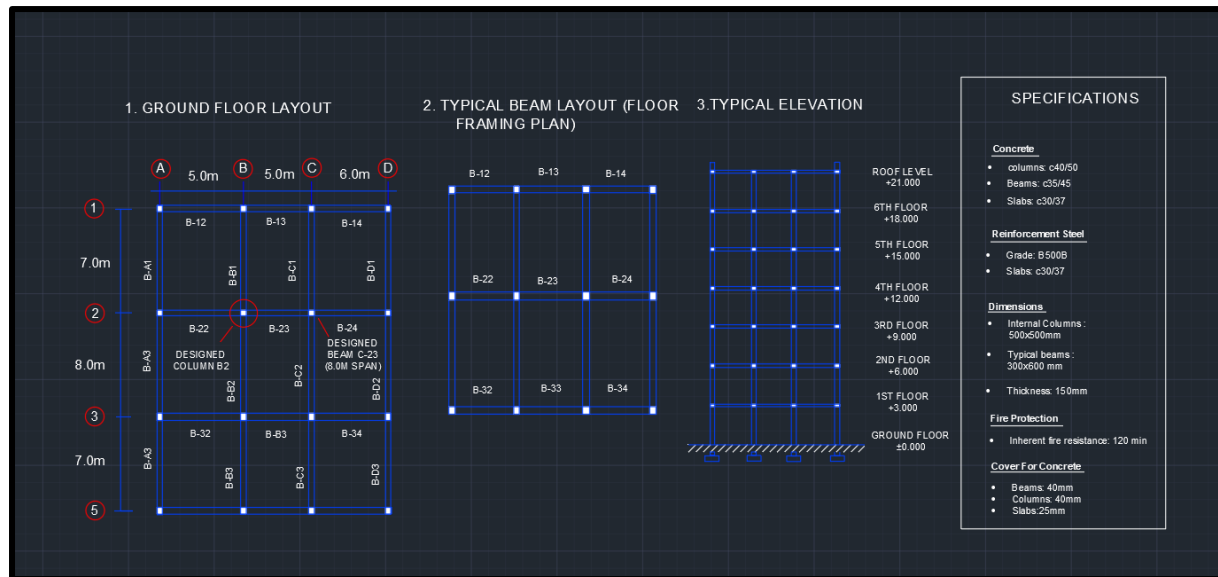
CAD Floor Layout, Beam Arrangement, Column Layout and Structural Specifications for the Lawan Project
